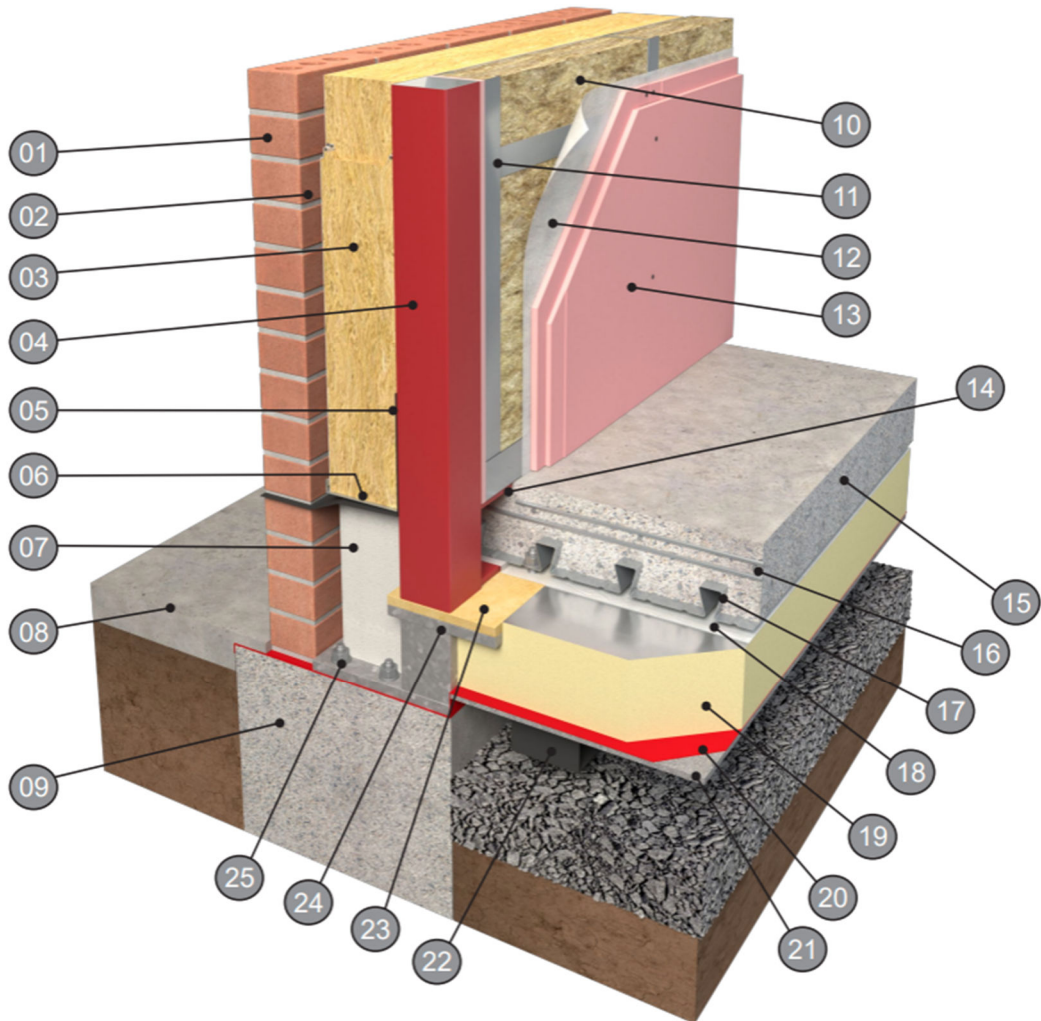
External wall with traditional brick/block outer leaf cladding to substructure detail
